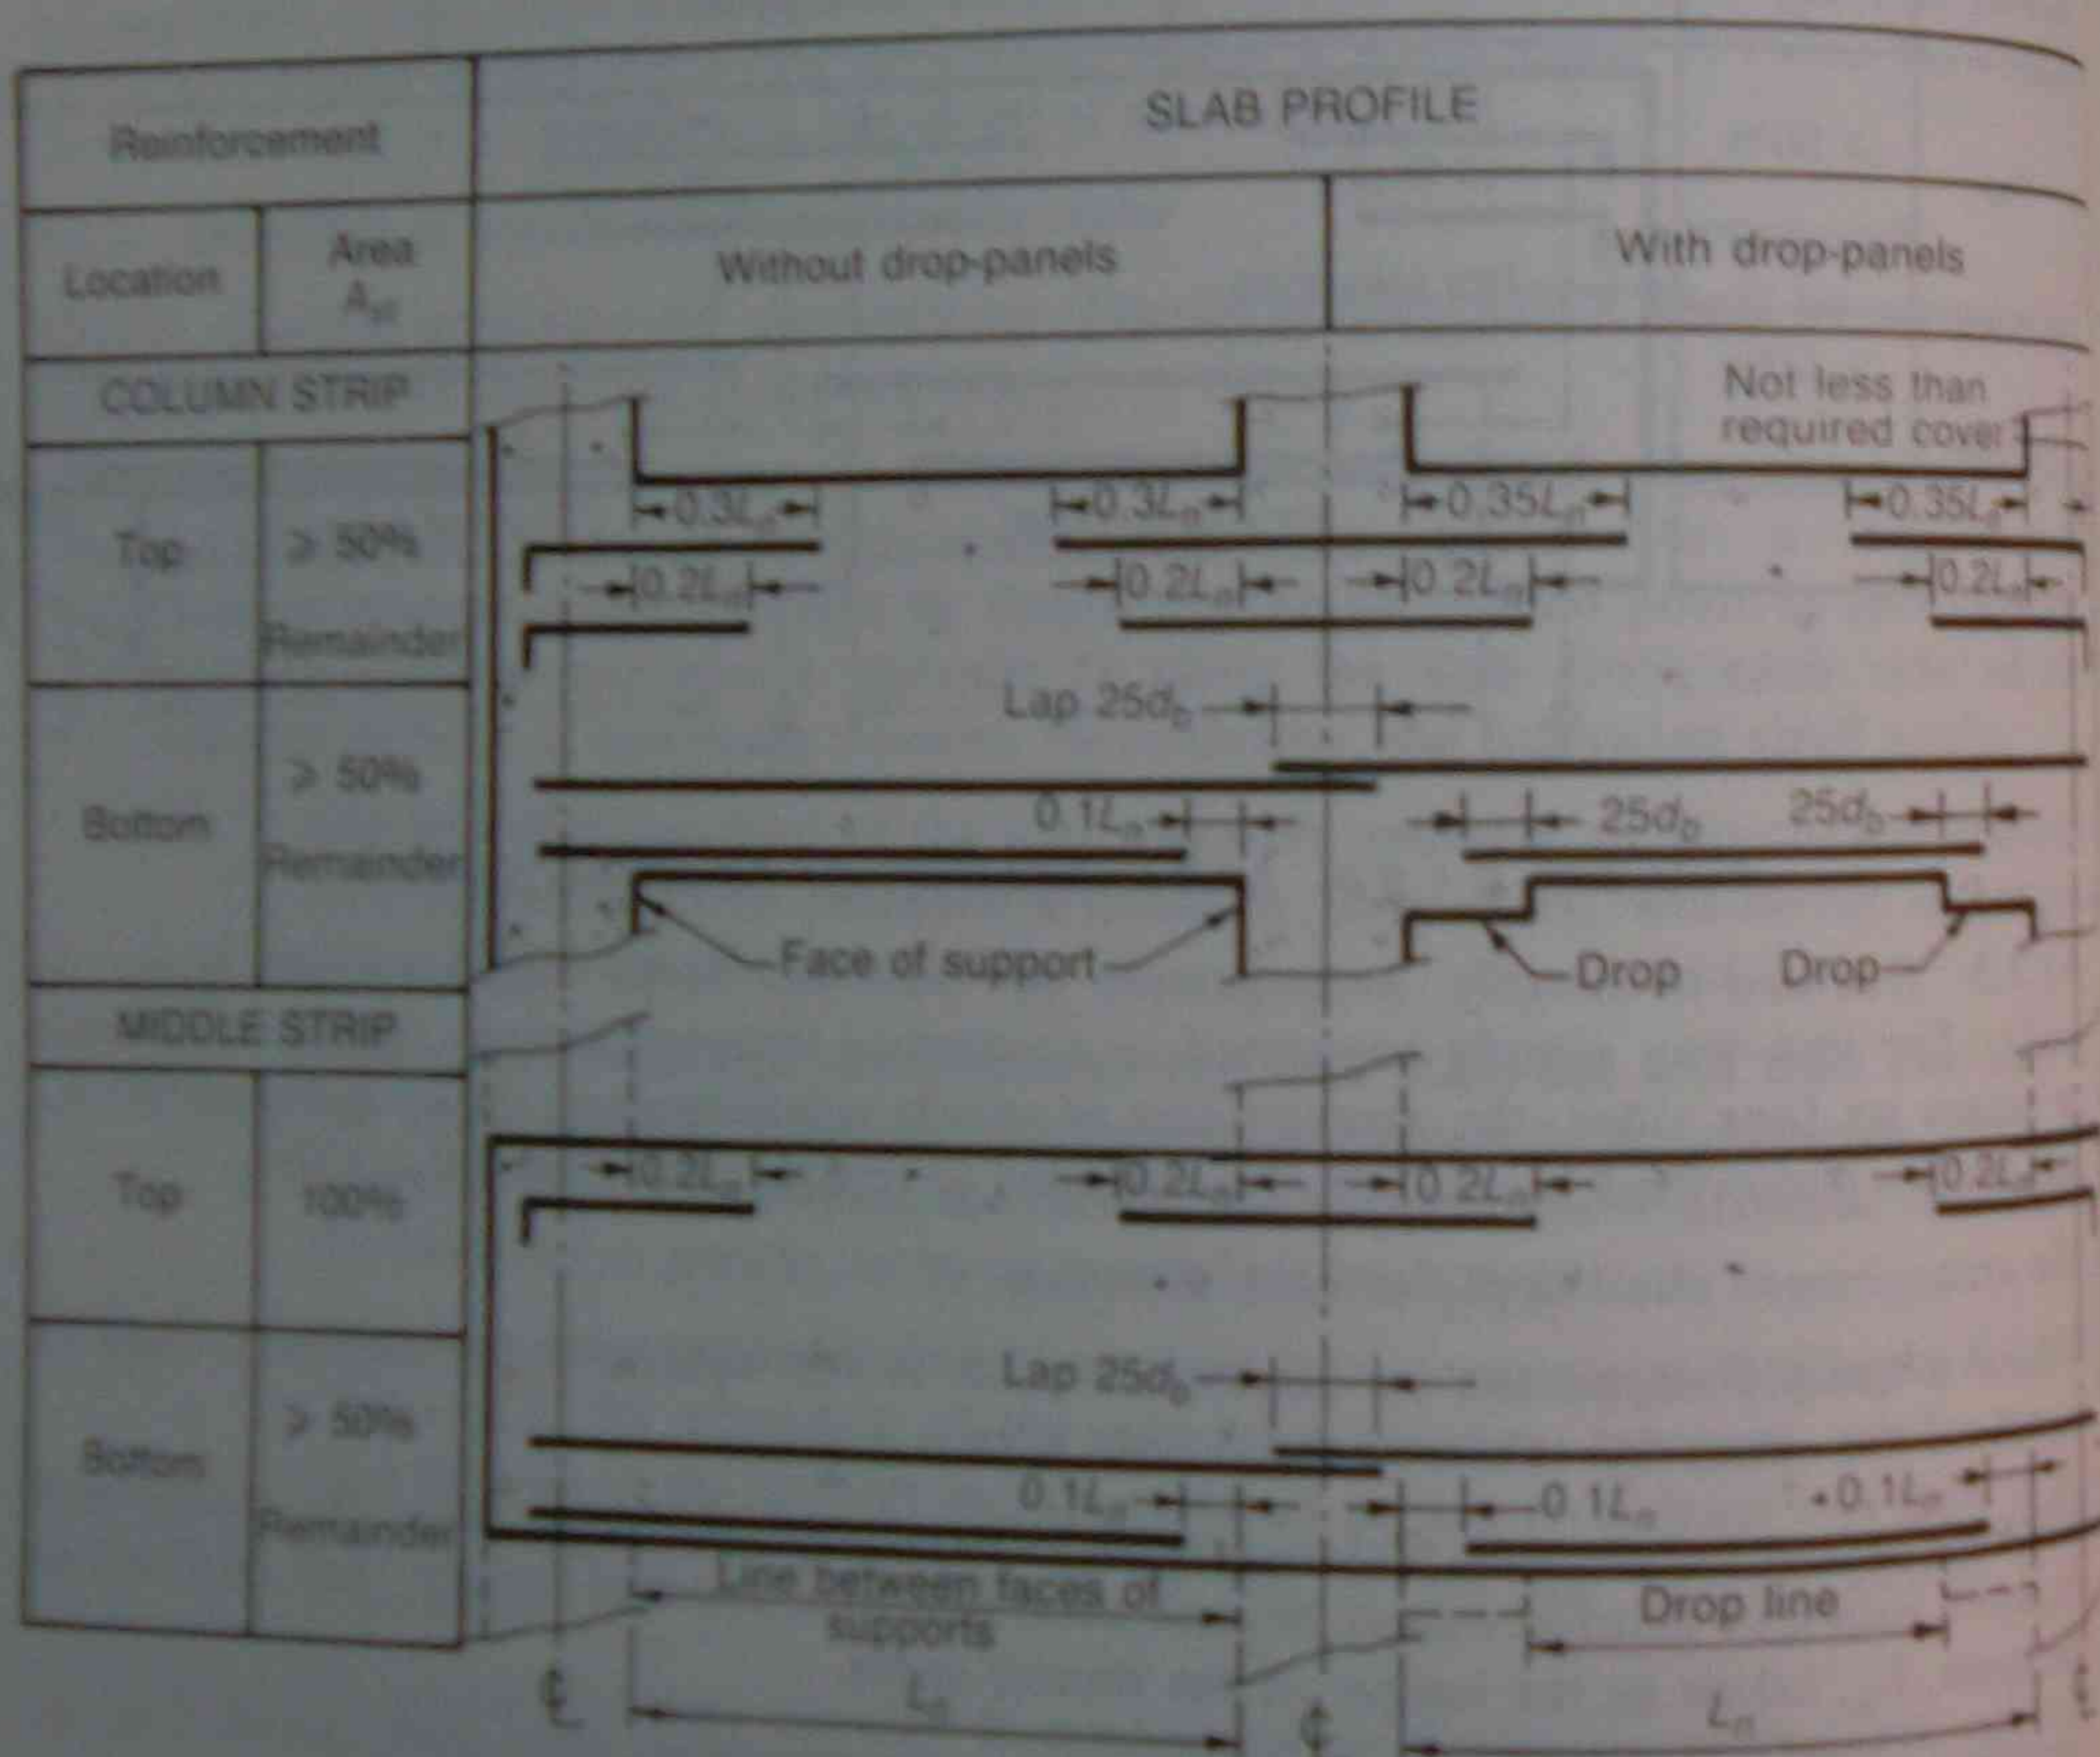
ARRANGEMENT OF REINFORCEMENT
